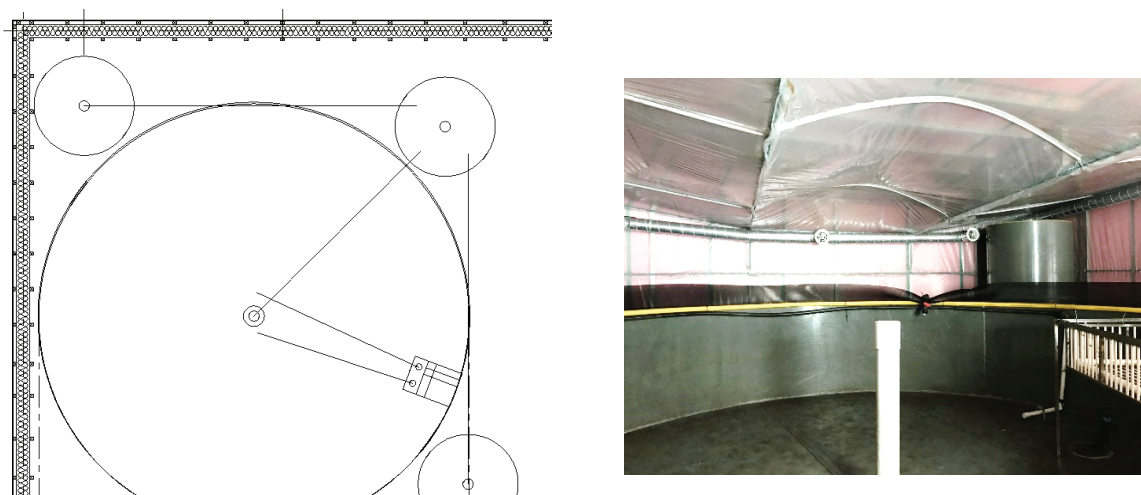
Plan (left) and interior view (right) of the Passive fish-farming house (Design 3).
